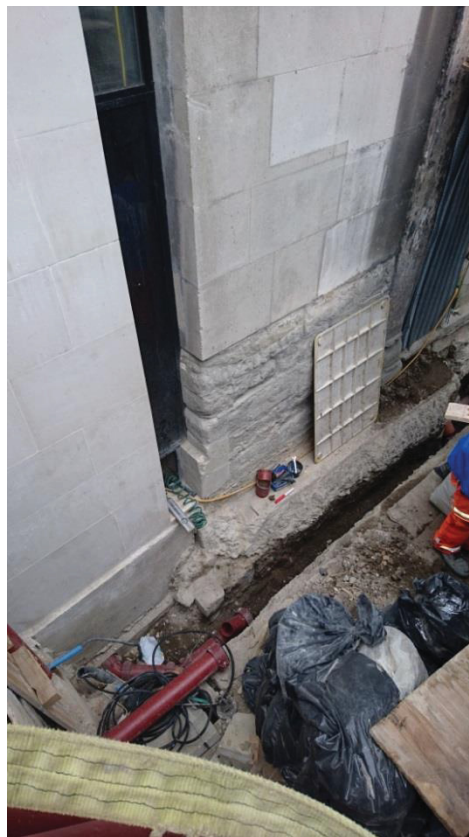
Ashlar foundations of St Mary Somerset tower in drain run looking north-east
